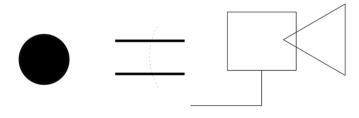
Architectural element – CCTV Source: Authors' own concept.
